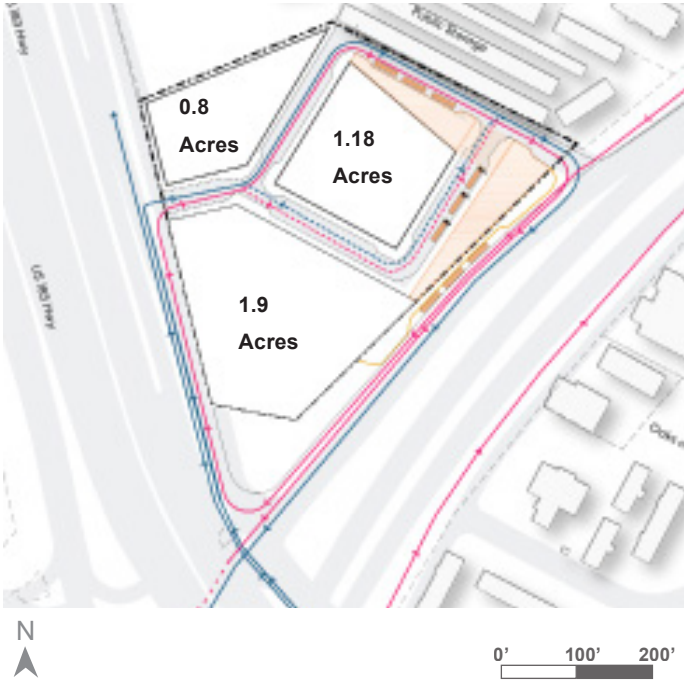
The graphic illustrates the site circulation and street design for CapMetro owned North Lamar Transit Center site
